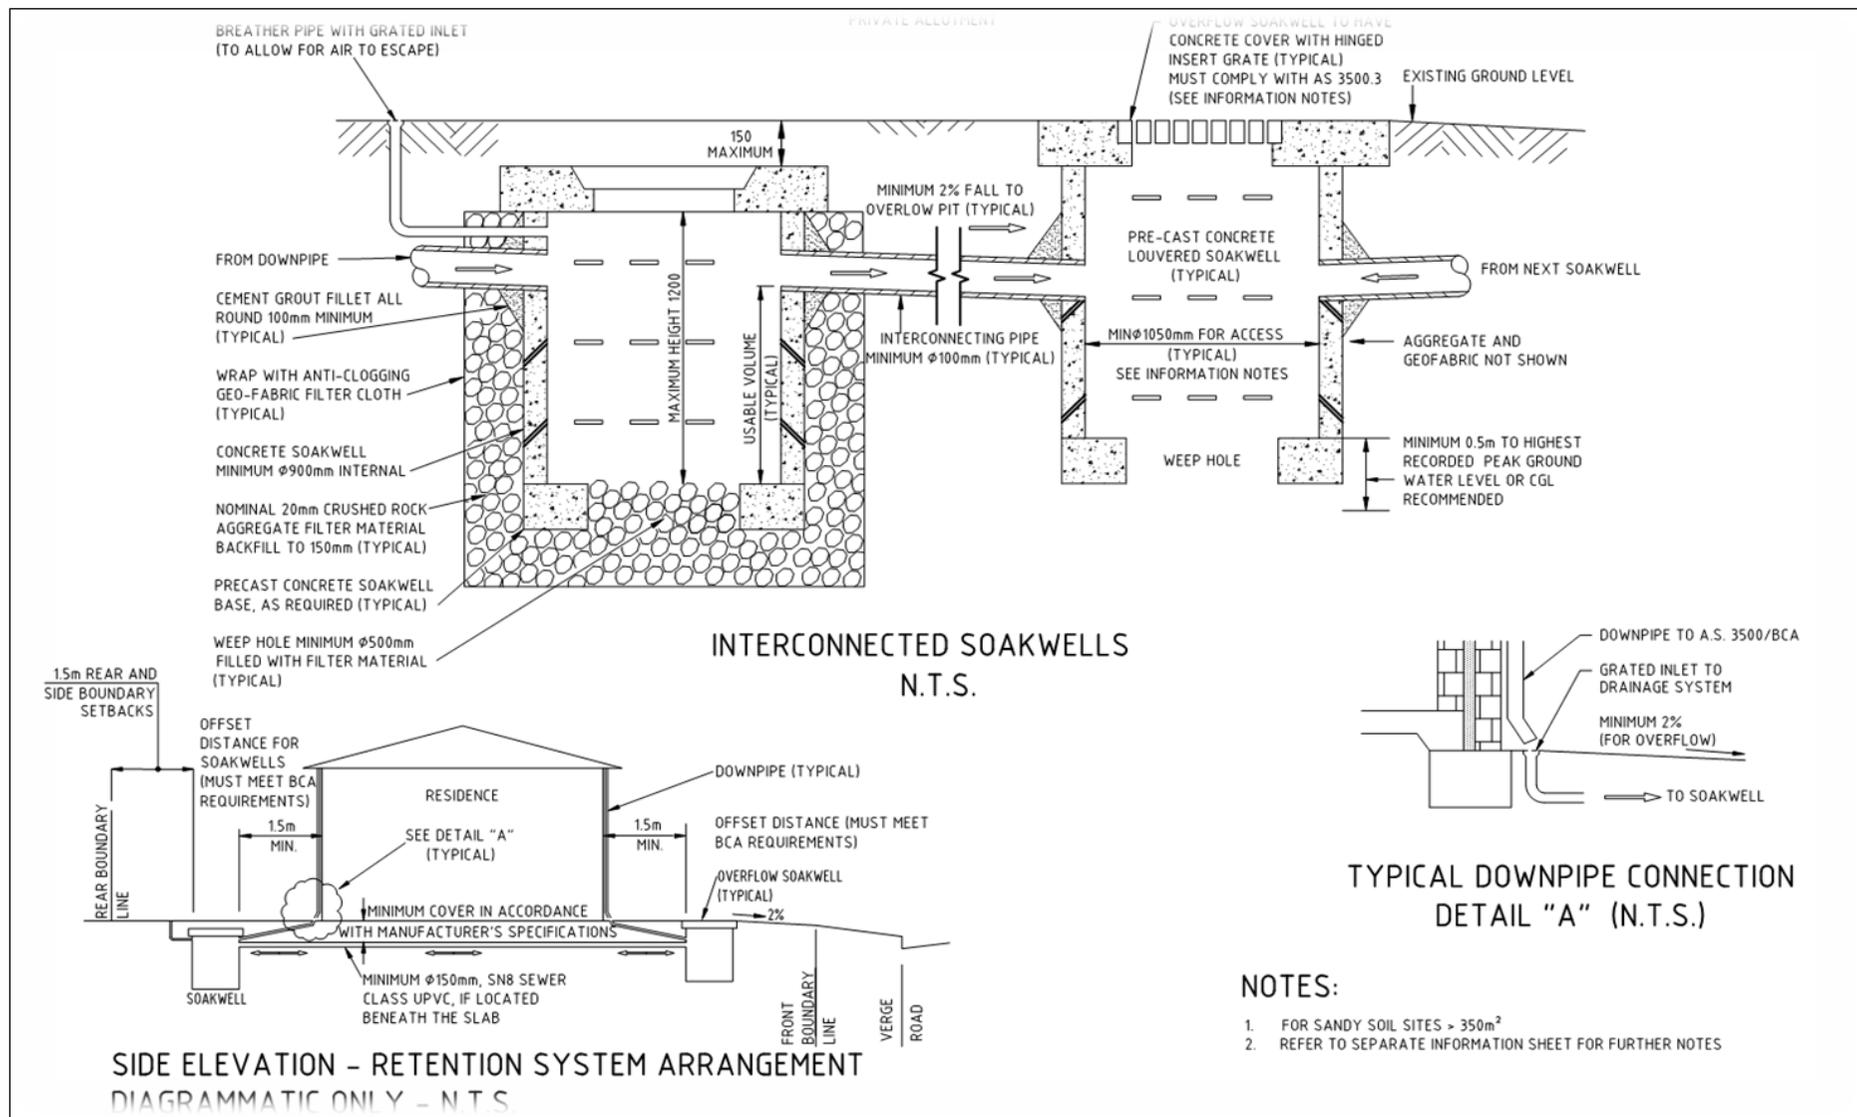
10 – Details of inter-connected soakwells and house/soakwells arrangement in high soil permeability sites
